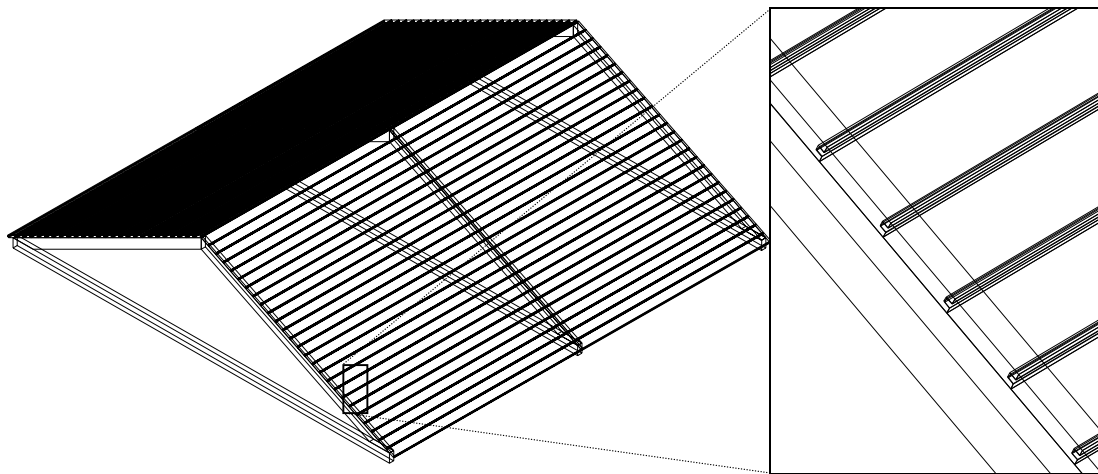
Typical roof construction, roof truss attached with t&g timber panels
